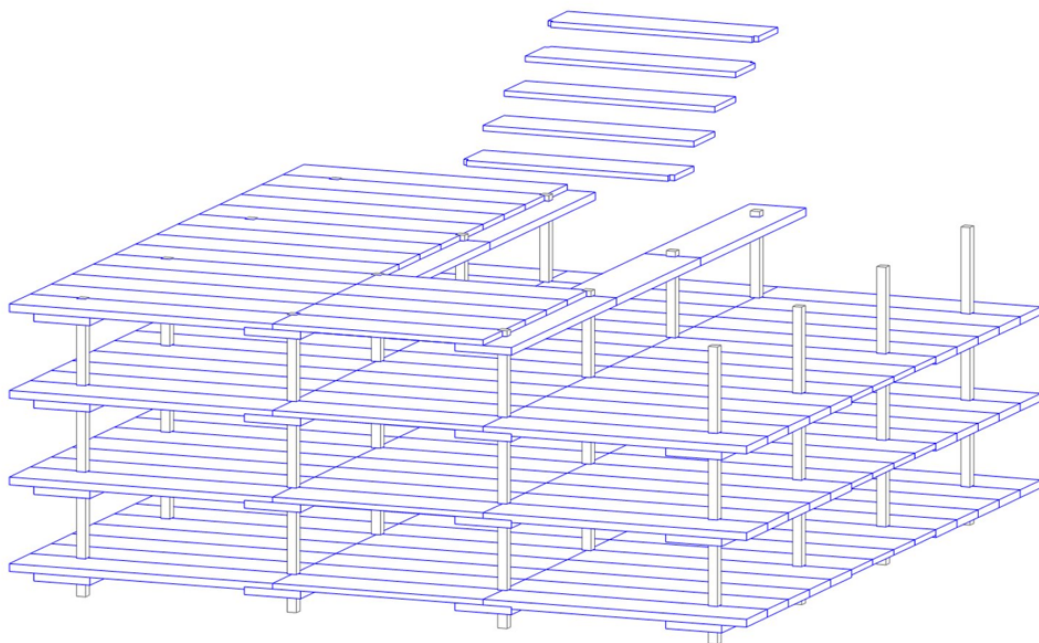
Indicative CLT band beam structure (X-Lam)
